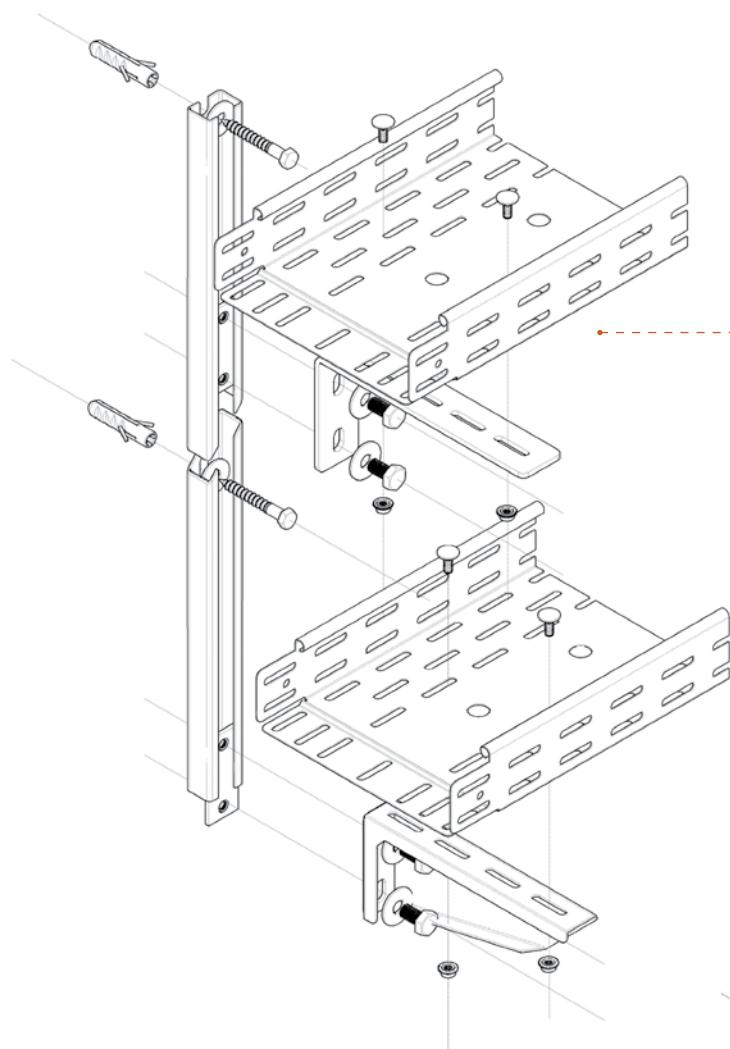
Example of the installation of the cable tray to the wall of the building with the NKP-UL load-bearing profile
